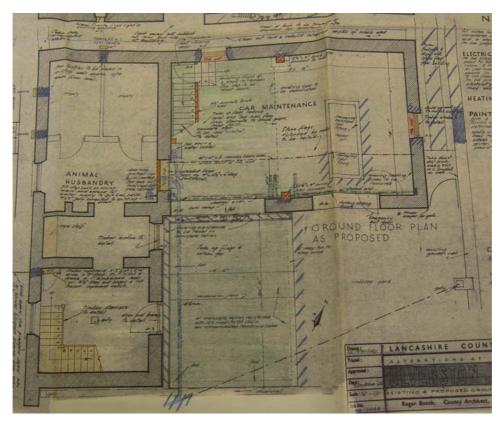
Coach House ground floor plan as proposed in 1966 (BDB 33/12/9 1966-9)
